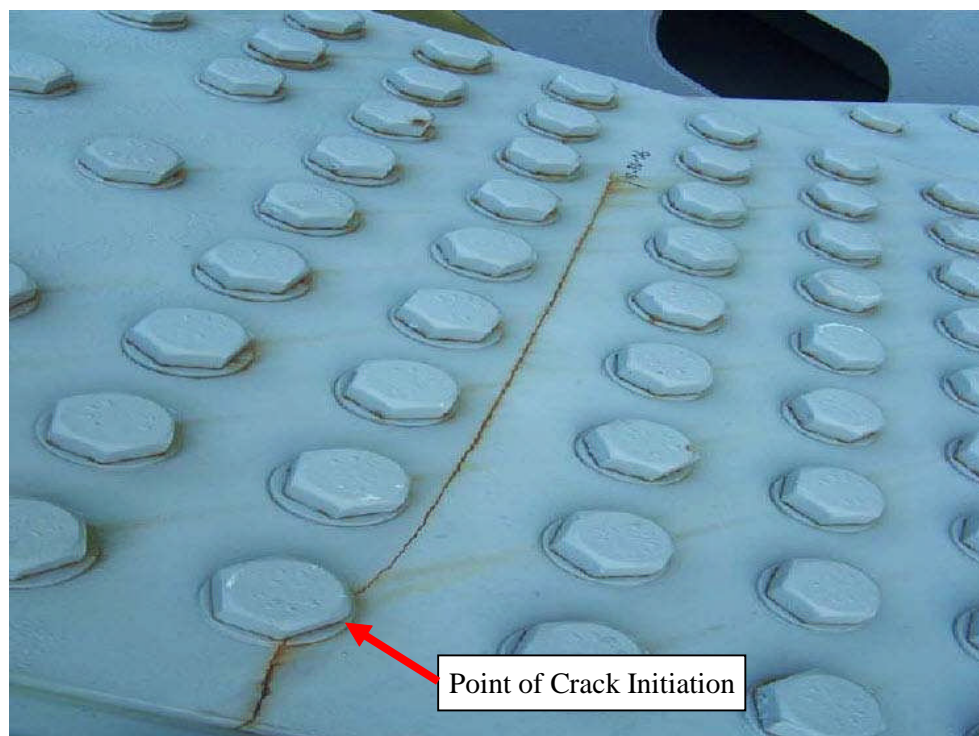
Cracked Gusset Plate and Point of Crack Initiation
